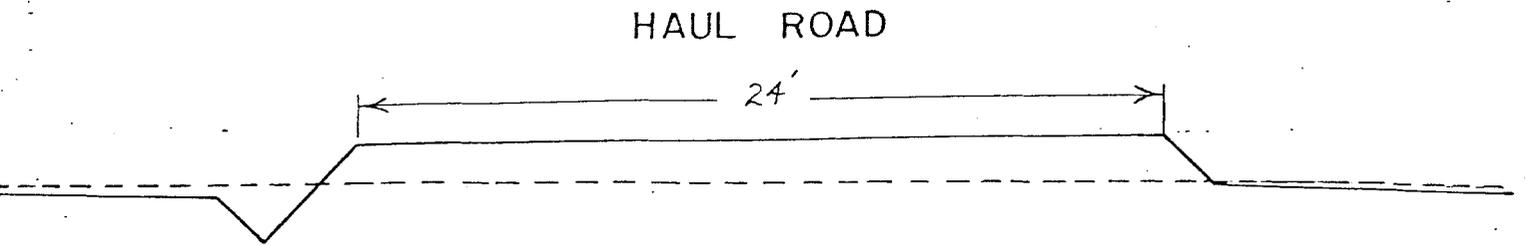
Typical Cross-Section of Haul Road & Access Road
